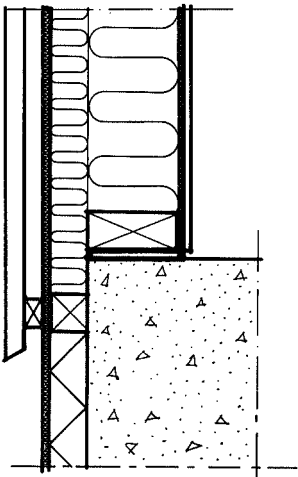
A joint between a wooden wall and a concrete slab with insulation on the upper surface. Using this solution the plastic foil on the wall is drawn in under the floor insulation in order to ensure airtightness. Even if the concrete slab is insulated on the upper side, skirting insulation is necessary.
